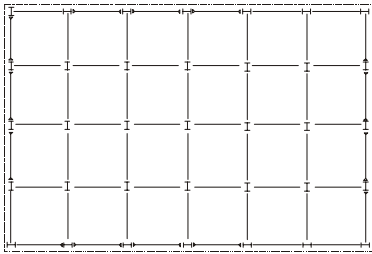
Structural framing and typical floor plans for the three SAC buildings
